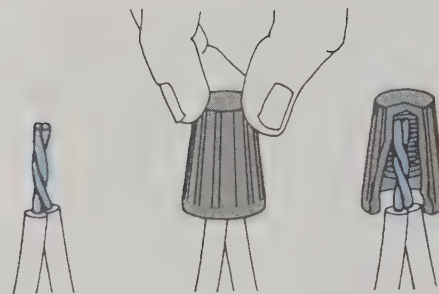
A wire nut is installed by twisting the bare wire ends together, then screwing the nut onto the twisted wires. For a sound mechanical and electrical connection, the wire nut must be tight.
